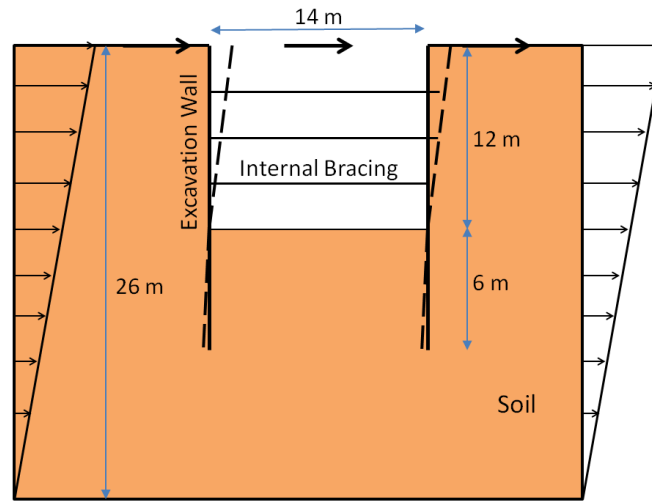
Schematic of racking deformations of the braced excavation shown with general dimensions of the modeled excavation in the centrifuge tests (deformations shown are not to scale).
